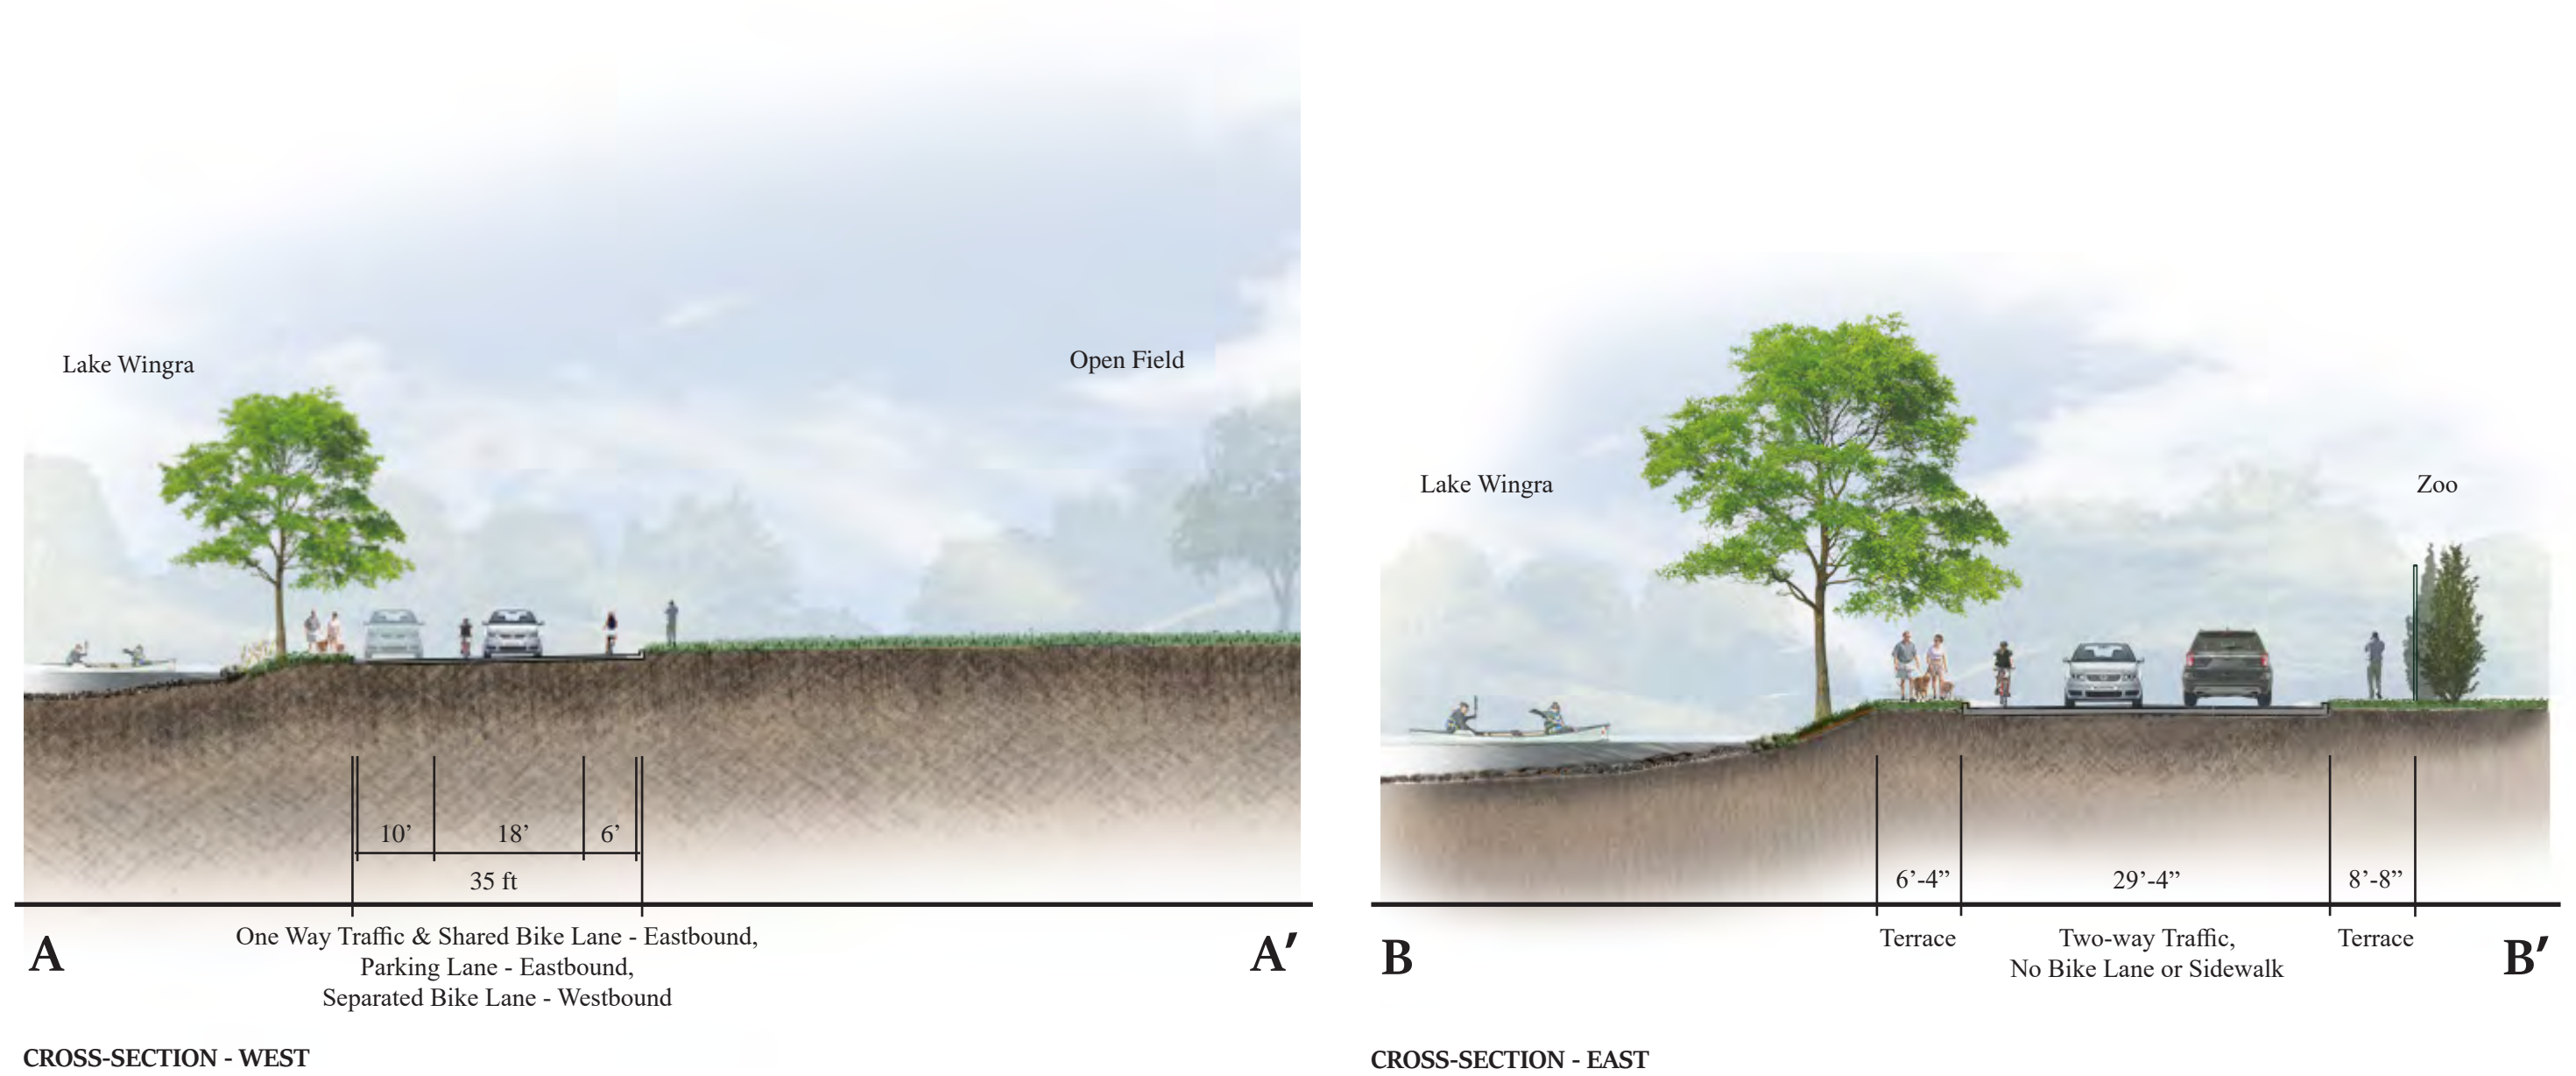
Vilas Park Drive Existing Cross-Sections
